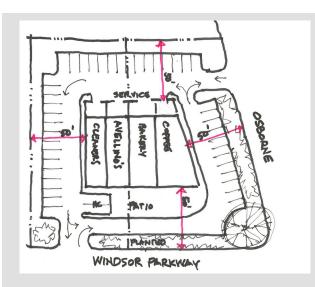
Sketch plan of Windsor Parkway at Osborne Road
